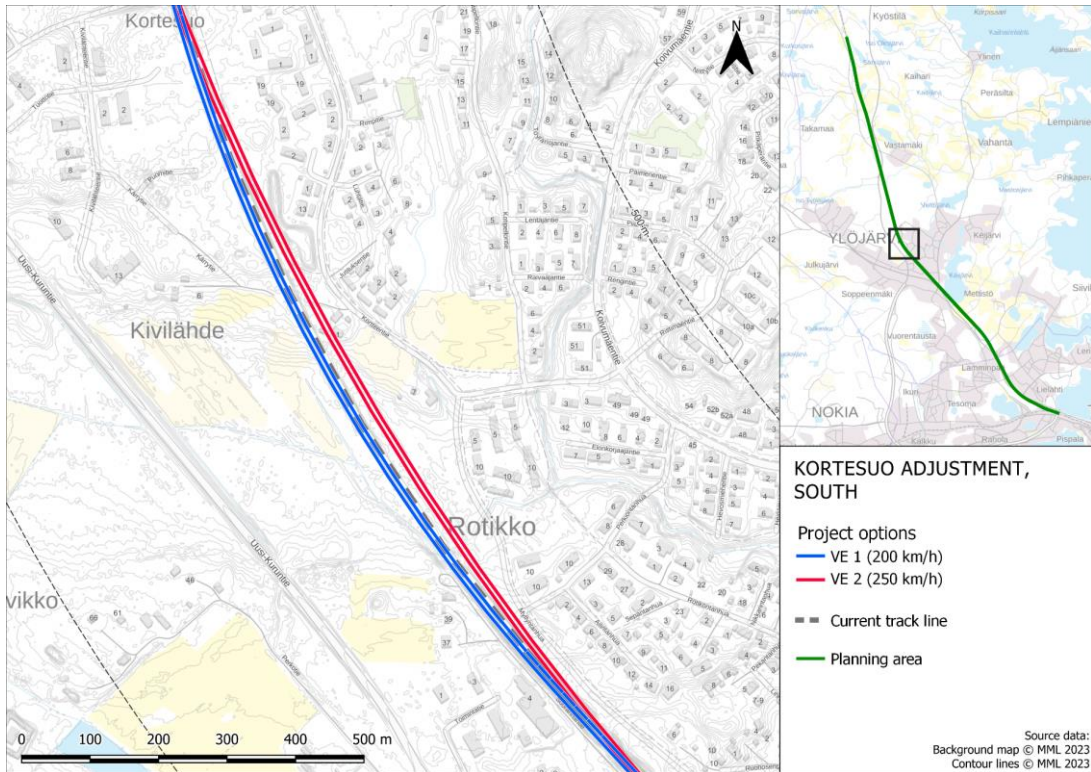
Kortesuo adjustment, south. Section before the Korte overpass.
